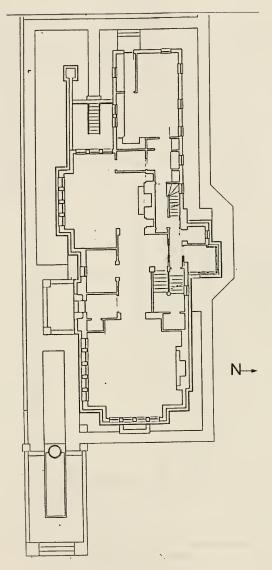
First Floor Plan of the Heller House Courtesy of John Vinci Architects.
